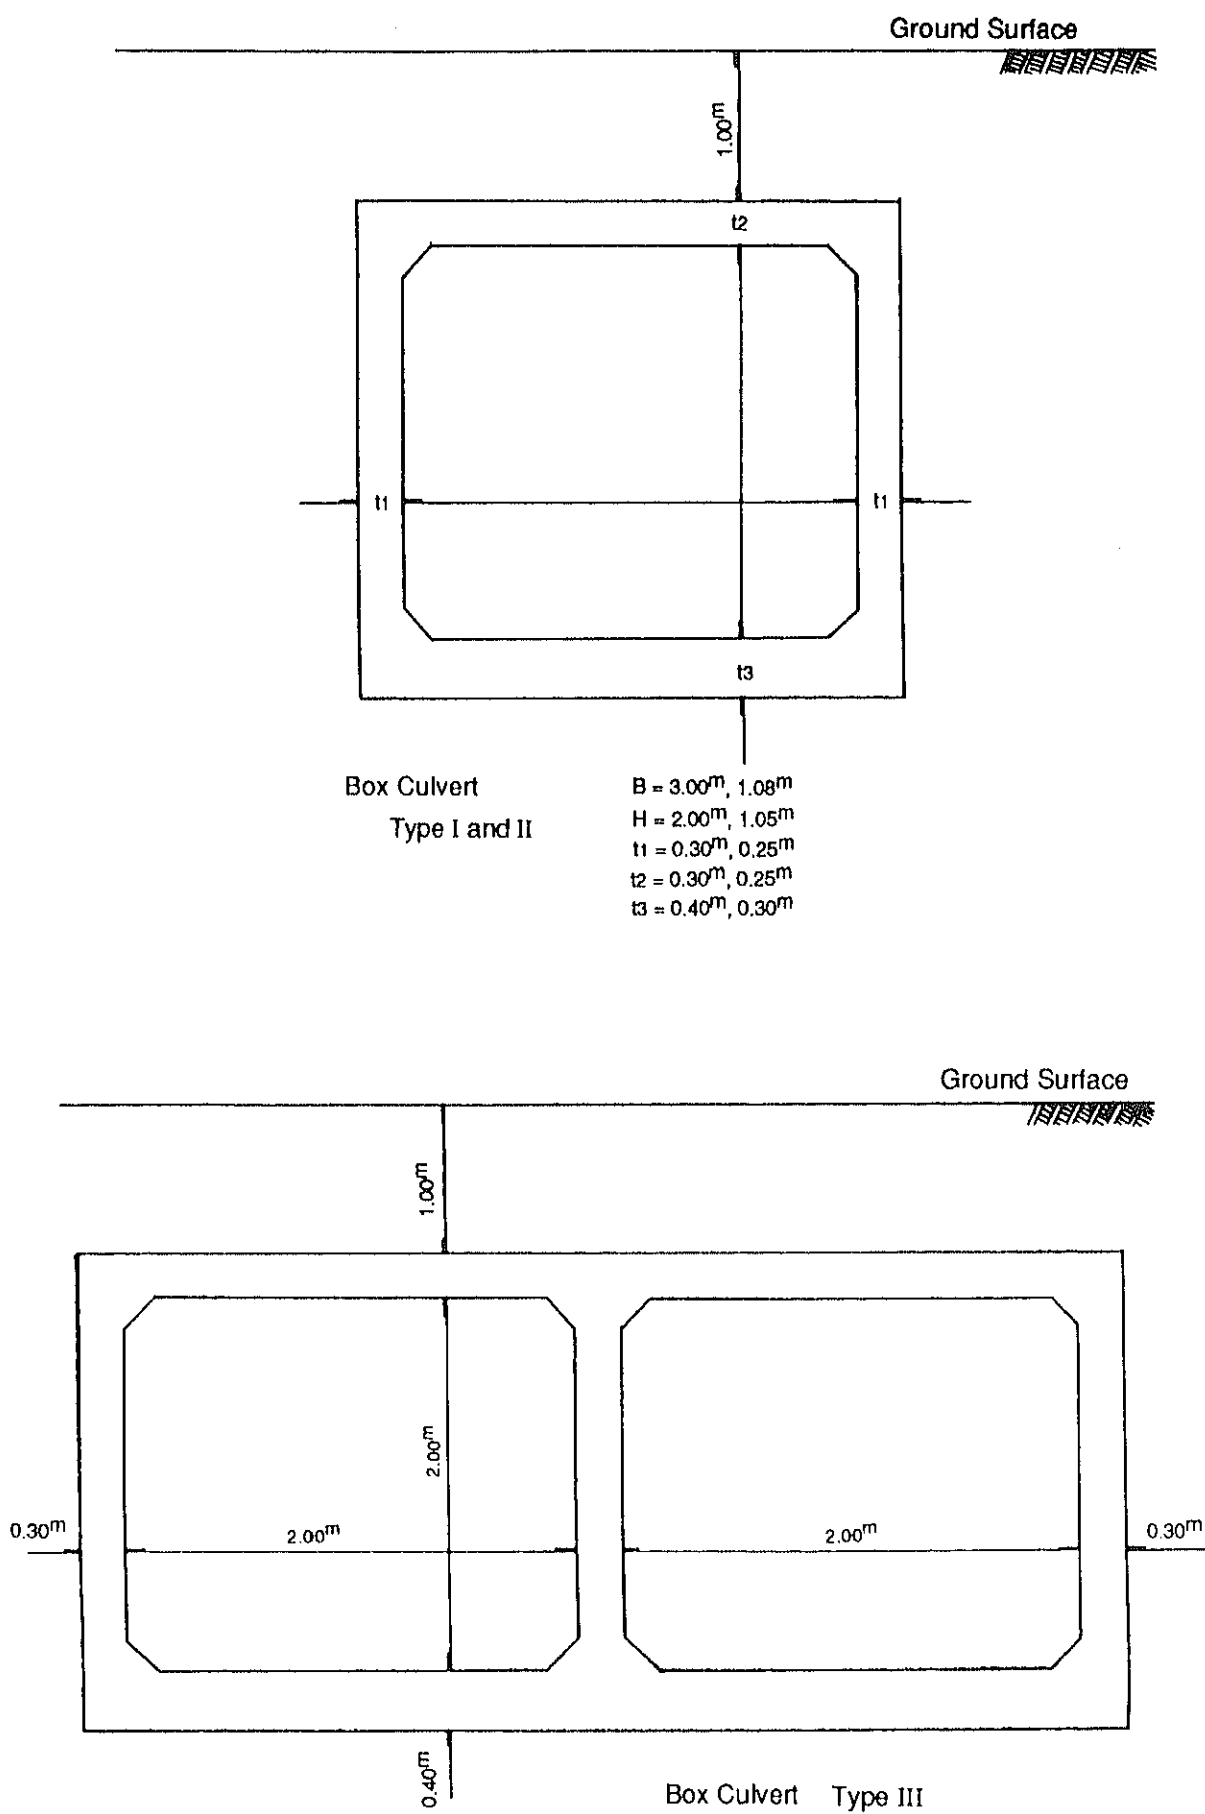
PROPOSED CROSS SECTION OF DRAINAGE CHANNEL (3) (BOX CULVERT)
